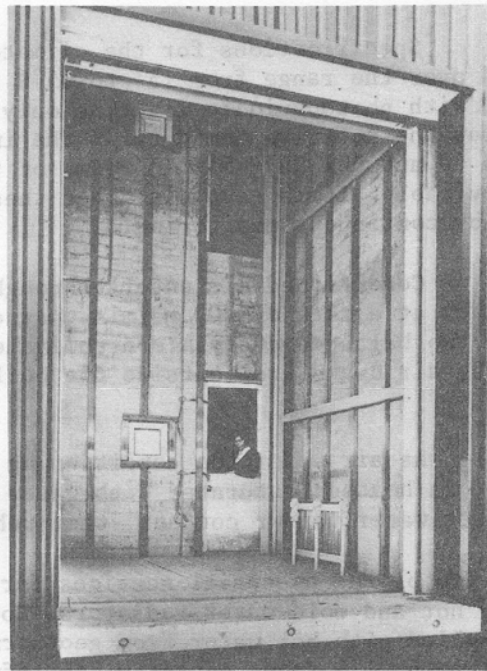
View into controlled climate room through the exterior door showing the wooden battens on the concrete walls to which the light reflecting liner will be attached. Entry to the rooms from inside the building is available through doors at the ground and first floor levels; entry ports for cables etc. are also available at these two levels.
